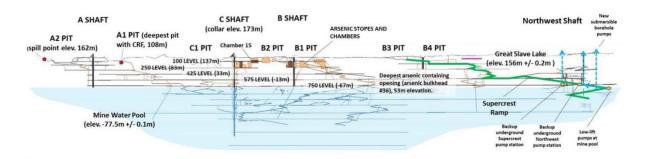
Schematic Long Section of Giant Mine (looking west) Showing Current Location of Minewater Elevation and Flooded Workings Below
